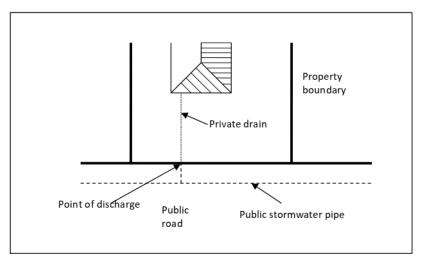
Point of Discharge Location - With Street Frontage To Public Stormwater Pipe
